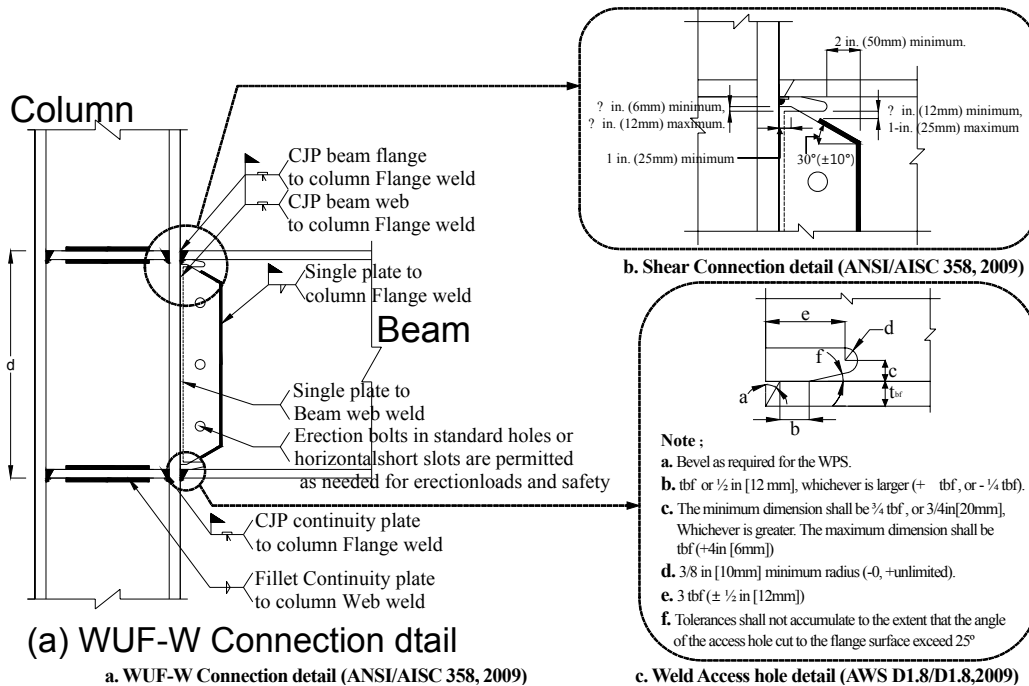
Details of Welded Unreinforced Flange with Welded Web (WUF-W) connections[4,8]
